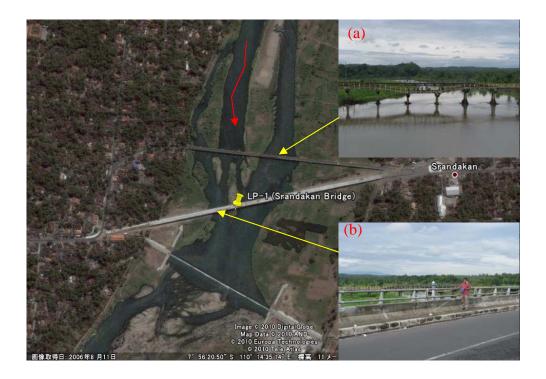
(a) The settled down piers and (b) the constructed new bridge. The both photos were taken in December 2008 (Source: Google Earth, 2010)
